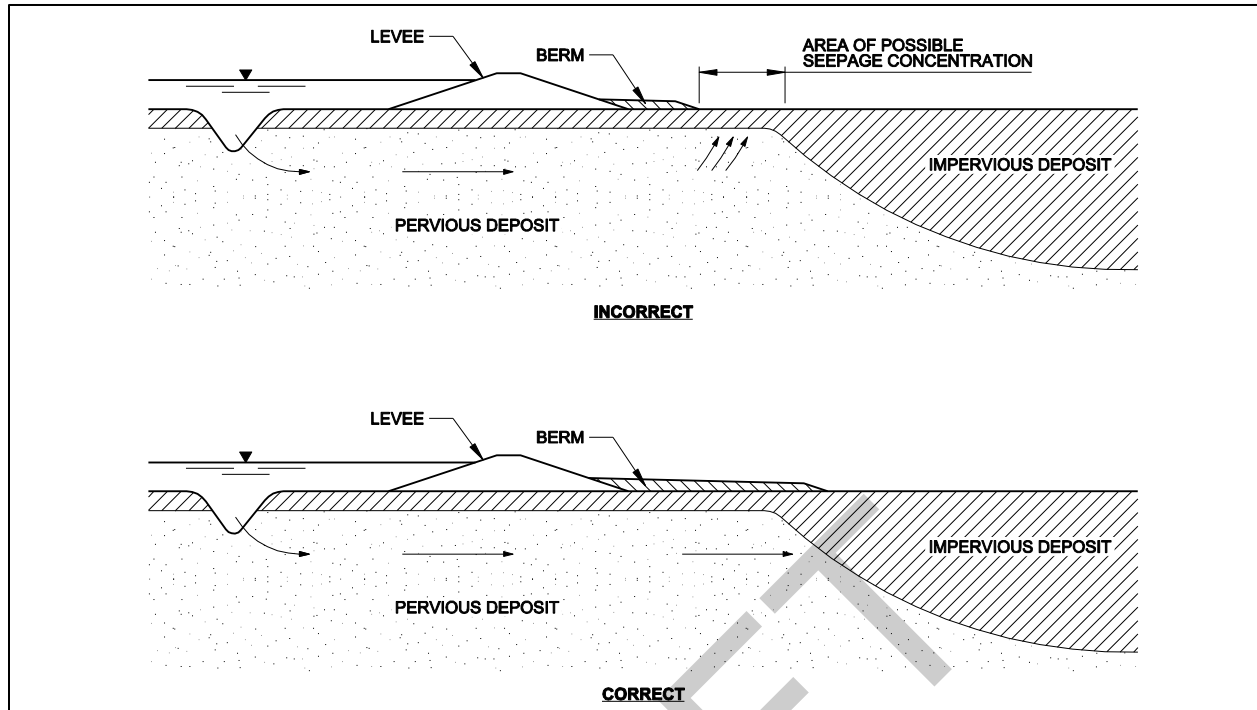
Example of Incorrect and Correct Berm Width According to Existing Foundation Conditions (thicker impervious deposit at a distance).
